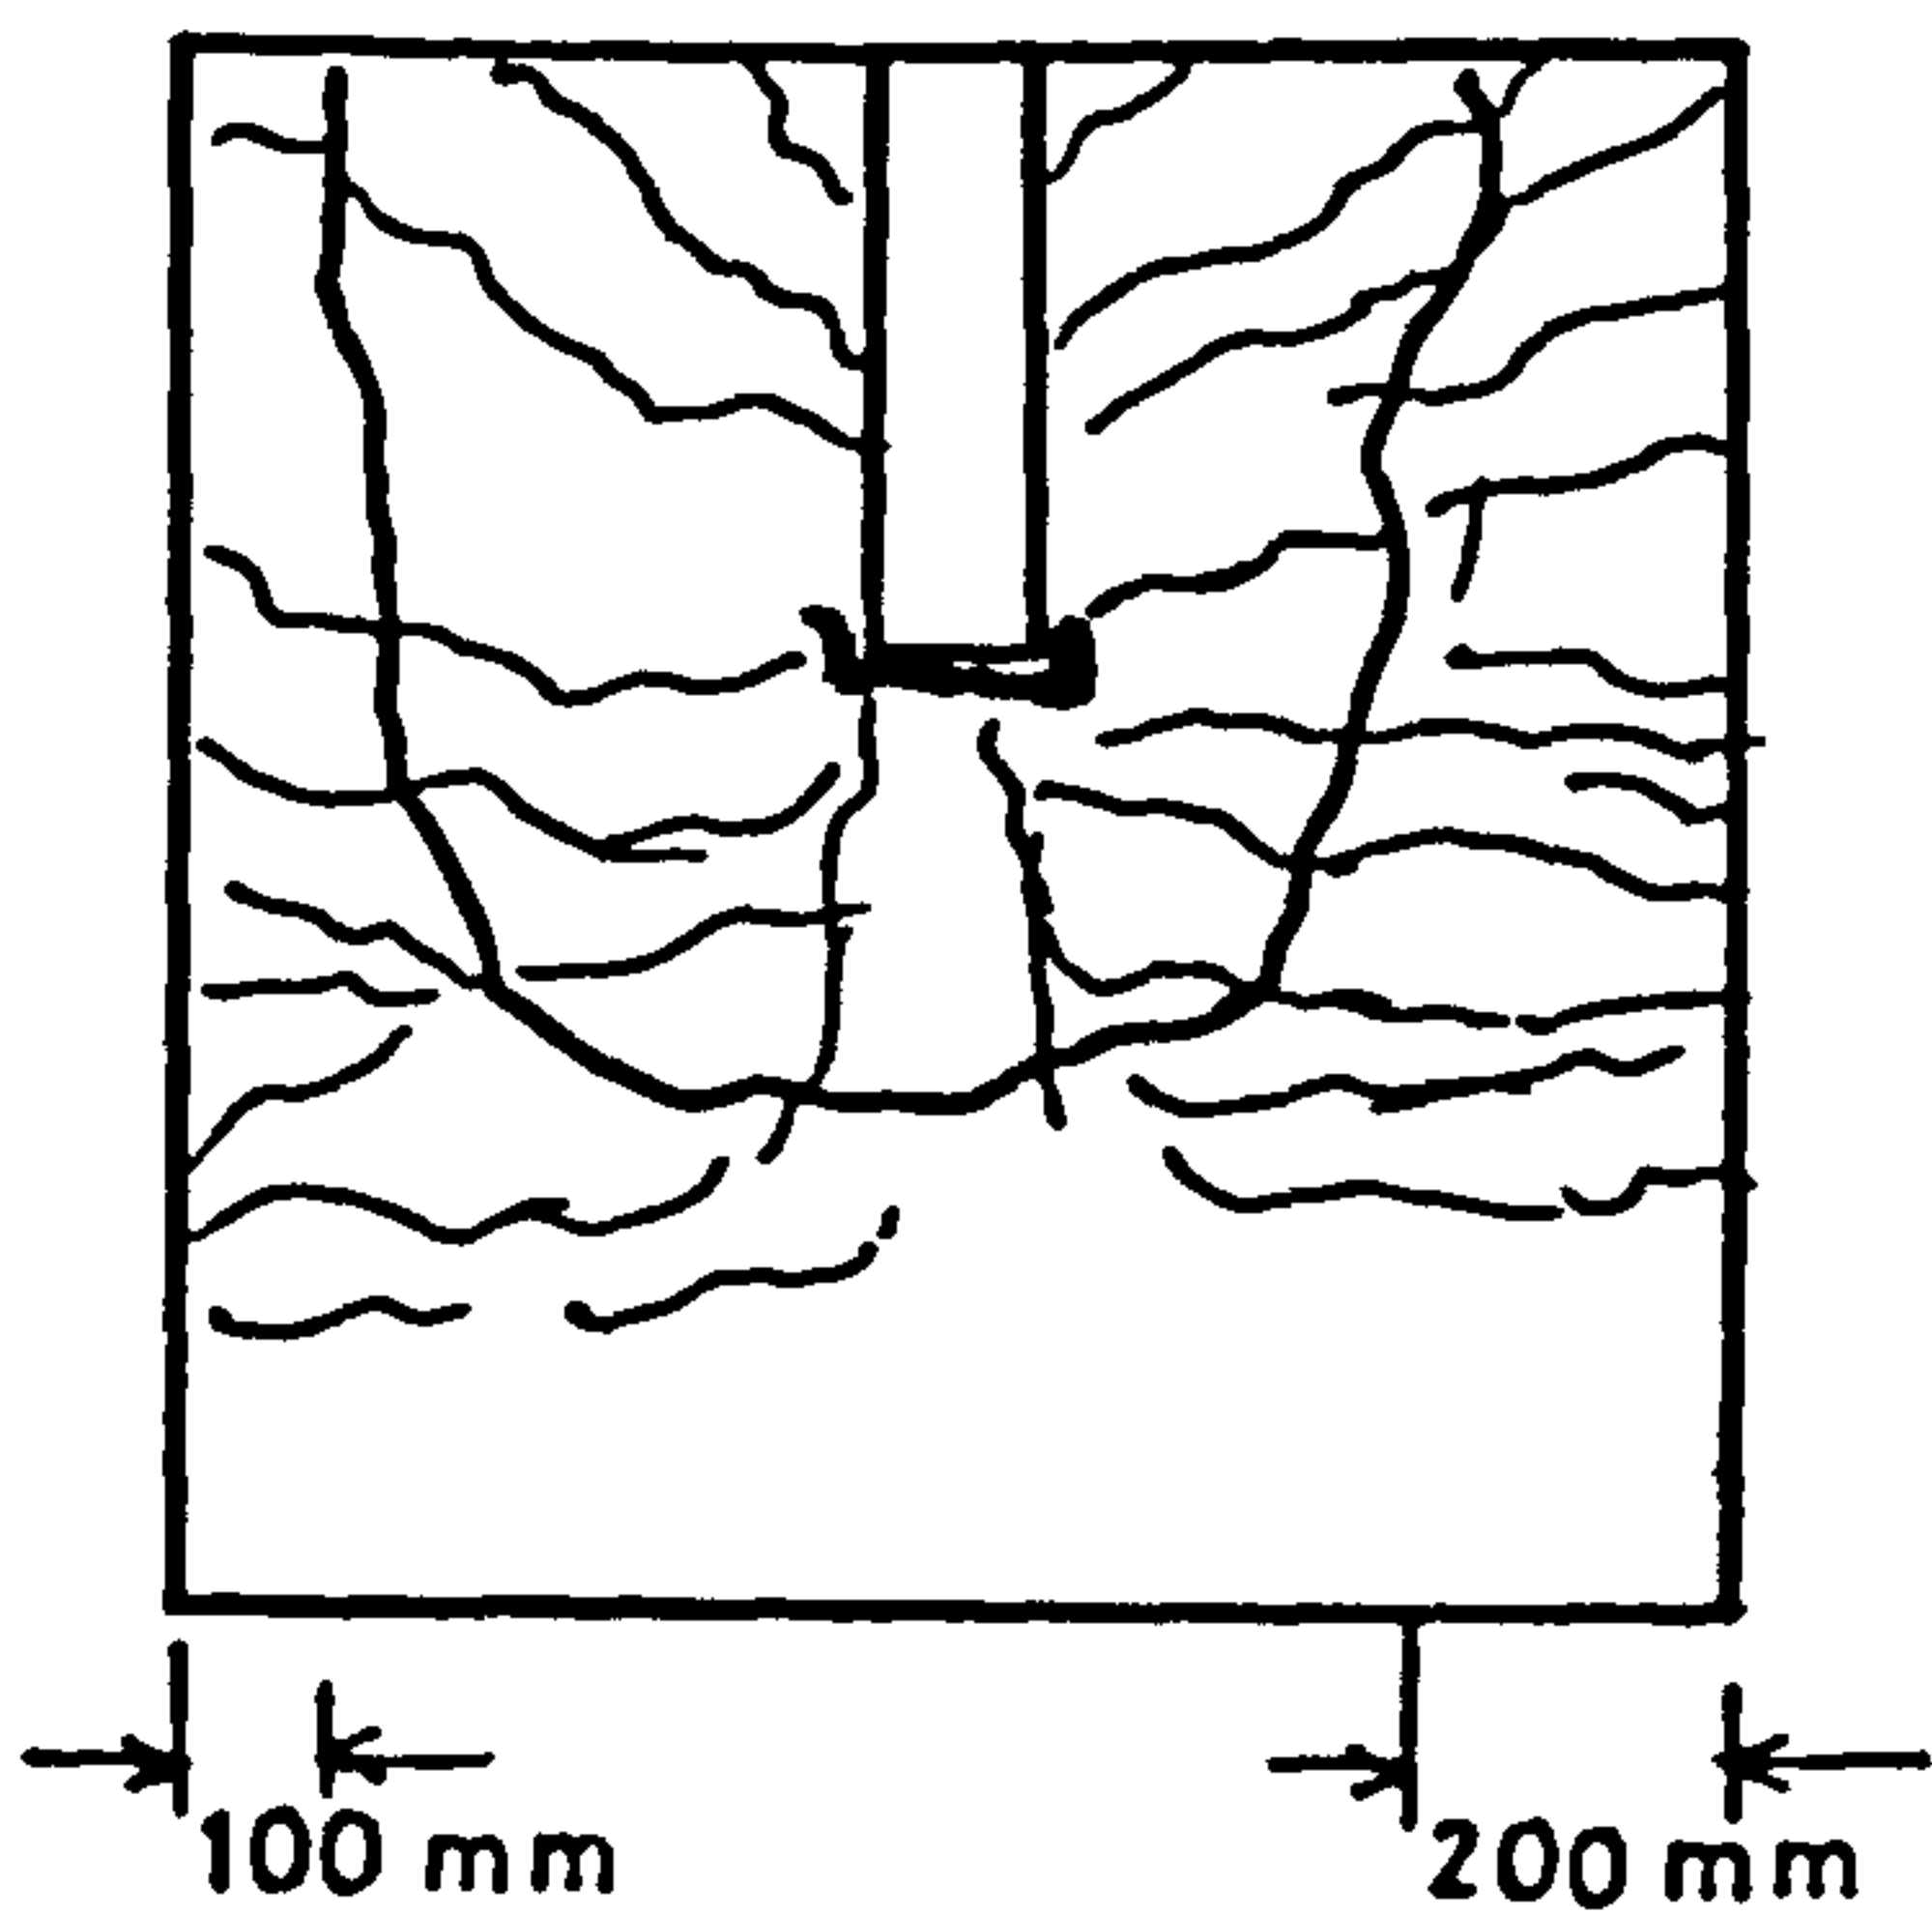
Crack pattern of the slab of PT2, after failure.
